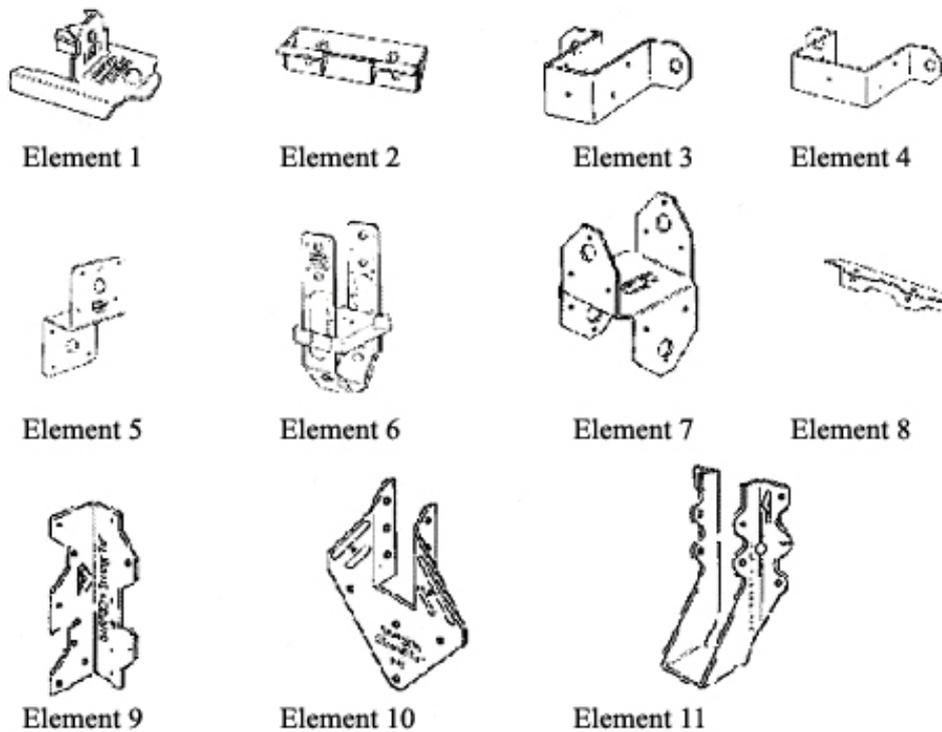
Hot formed steel connection elements used in light gauge steel systems
